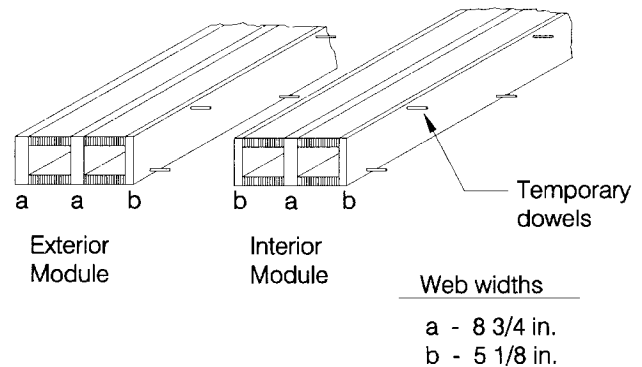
The bridge was preassembled into a series of four interior and two exterior bridge modules.
